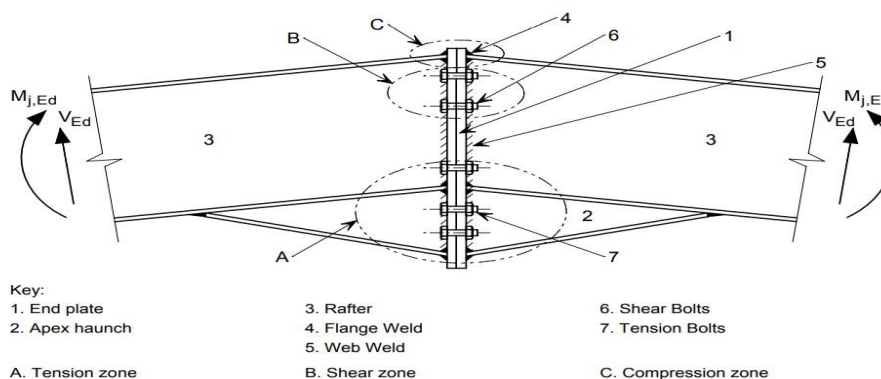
Portal frame apex connection with bolted extended end plate (Brown et al., 2013)
